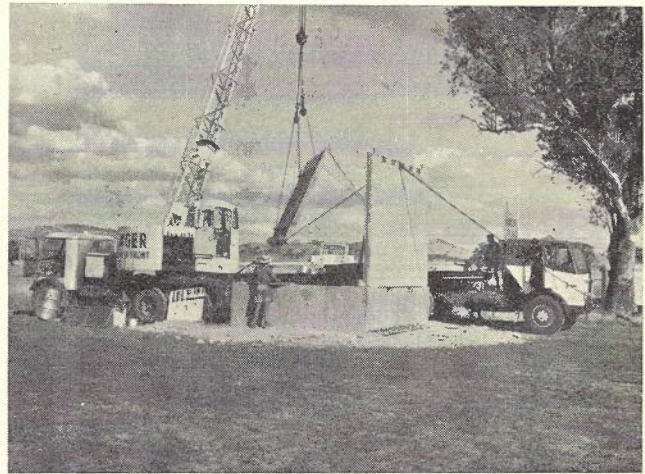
Erection of Second External Wall Unit on a Raised Site (Willie Ploma).
